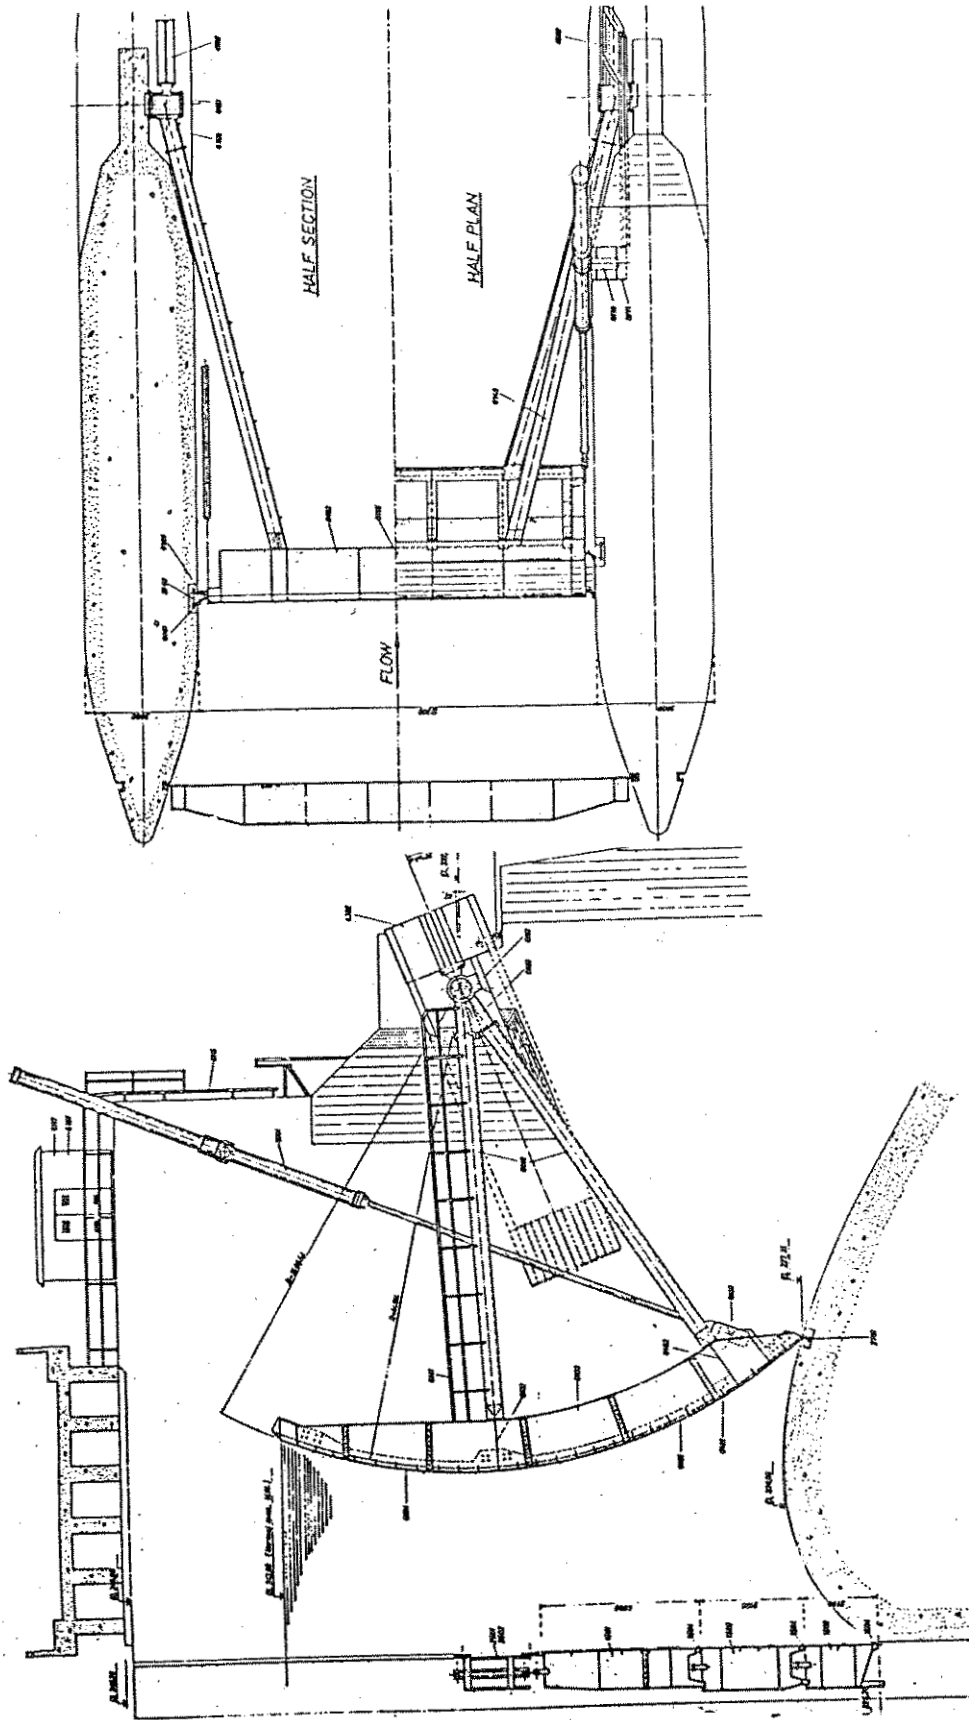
Tainter Gate, Hydraulic Hoist (Ref. 3)
